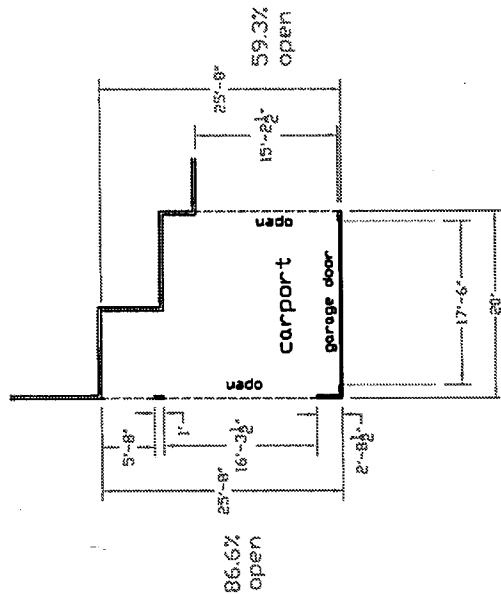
Exhibit B illustrates possible examples of parking areas that are adjacent to covered and enclosed entry ways. ZNA believes that Examples 1 through 6 are instances where the carport opening is not clear and unobstructed. We believe Examples 7 and 8 are acceptable under the current wording of the ordinance.
